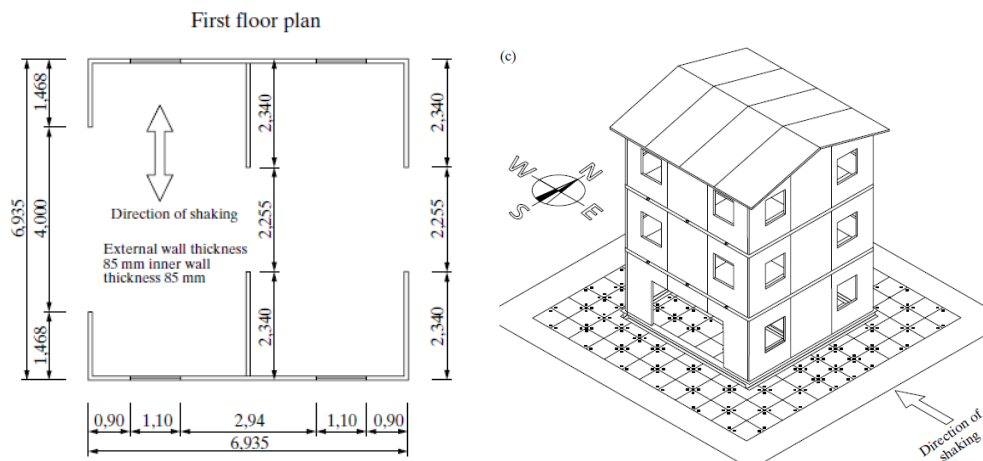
Building plan (left) and axonometric view of the shaken table test (right) [6.3].
